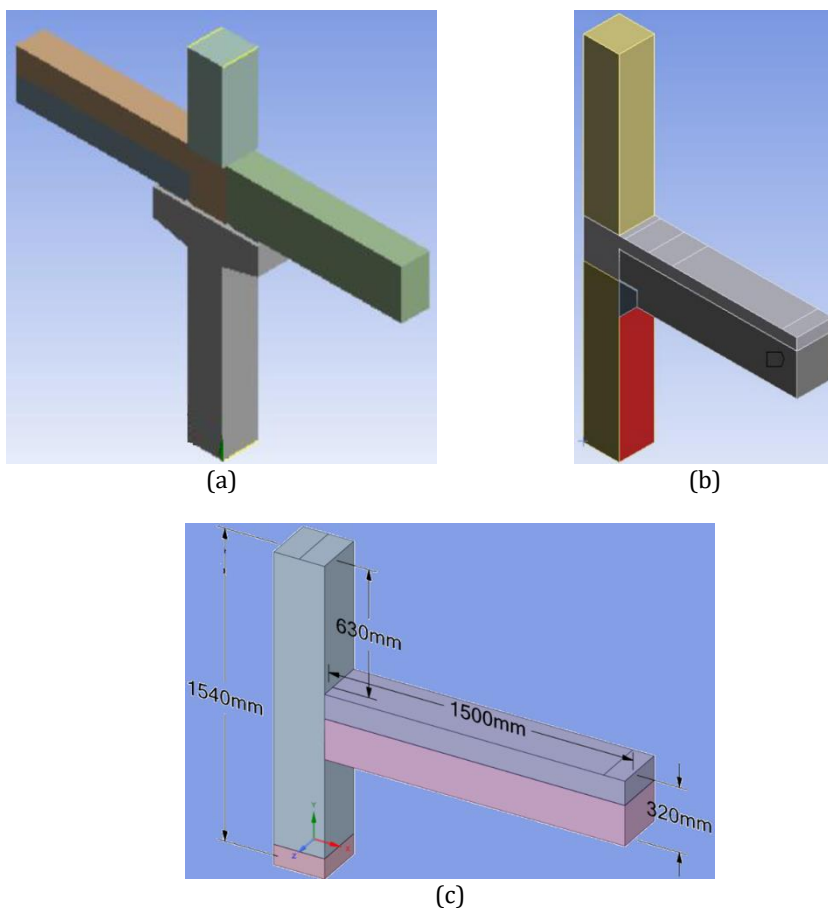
Geometric modelling: (a) concrete corbel, (b) concrete nib, and (c) inverted E steel nib
